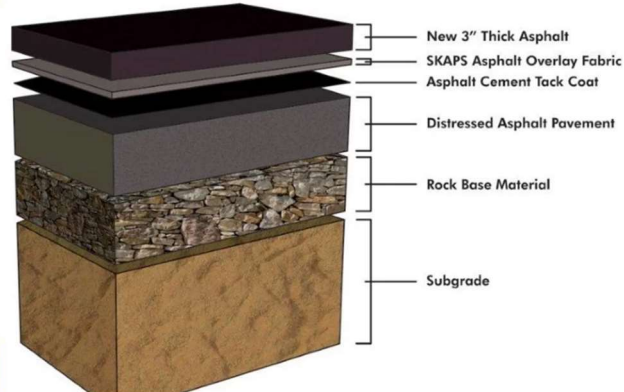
Asphalt overlay pavement structure (SKAPS Industries, n.d.)
